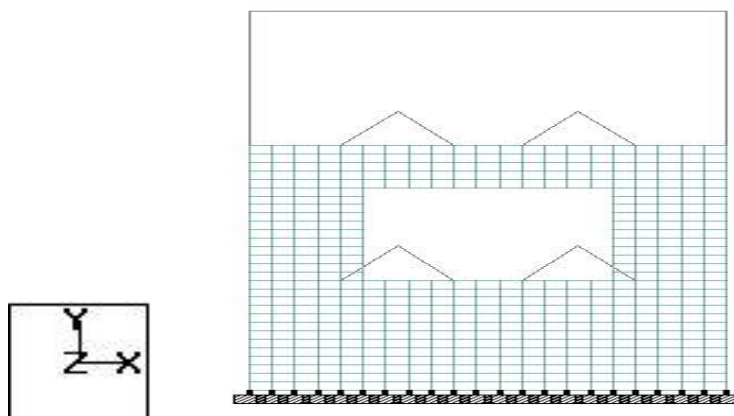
2D View of a Building Structure Model in X-Y Plane in STAAD.Pro
